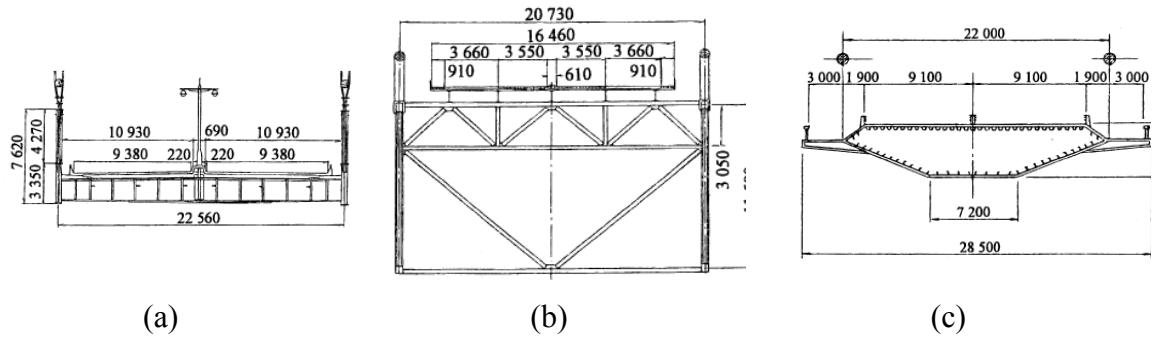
Three type of stiffening girders (a) plate girder, (b) truss, (c) box girder (Harazaki et al., 2000).
